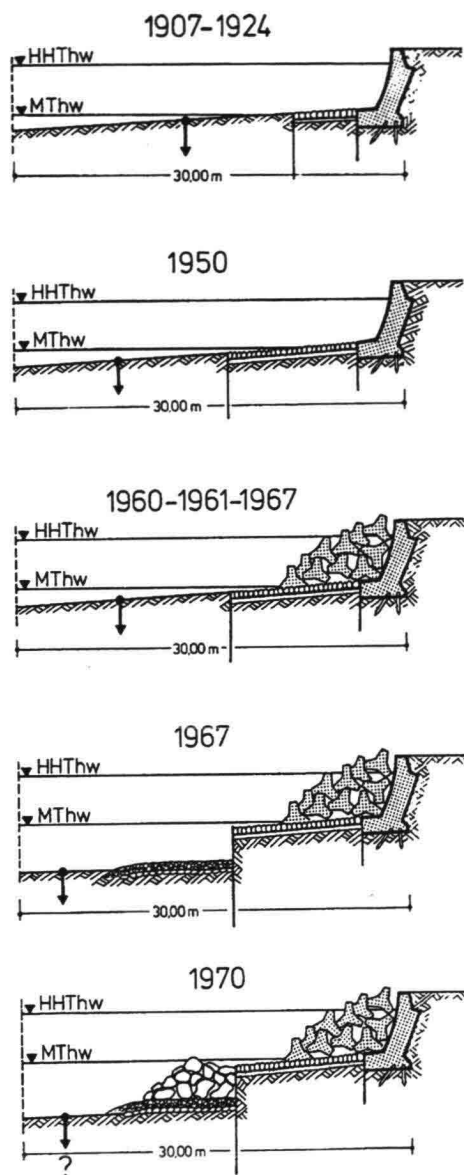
Sea wall at Westerland / Island of Sylt. Design and modifications (from (1))
